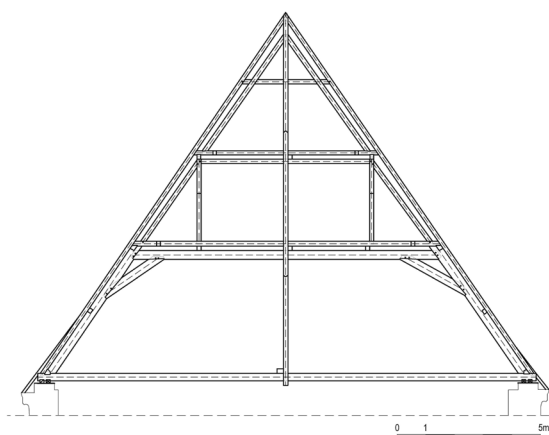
a. – Main truss of the roof structure of the Kogălniceanu street Reformed church, Cluj-Napoca – type code: A.2.2(c).-a/c(3:a-c-a)-I-A(1)
